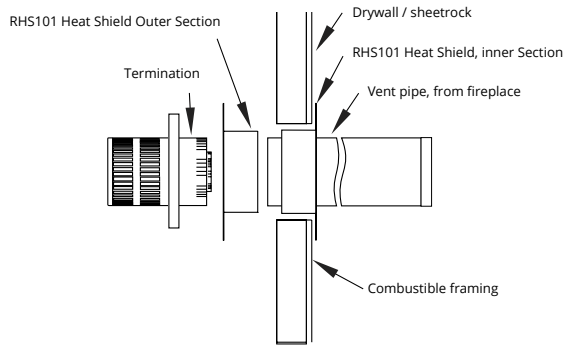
c RHS101 Installation. (Install by sliding Outer Section over vent pipe where it passes through the combustible construction.)
